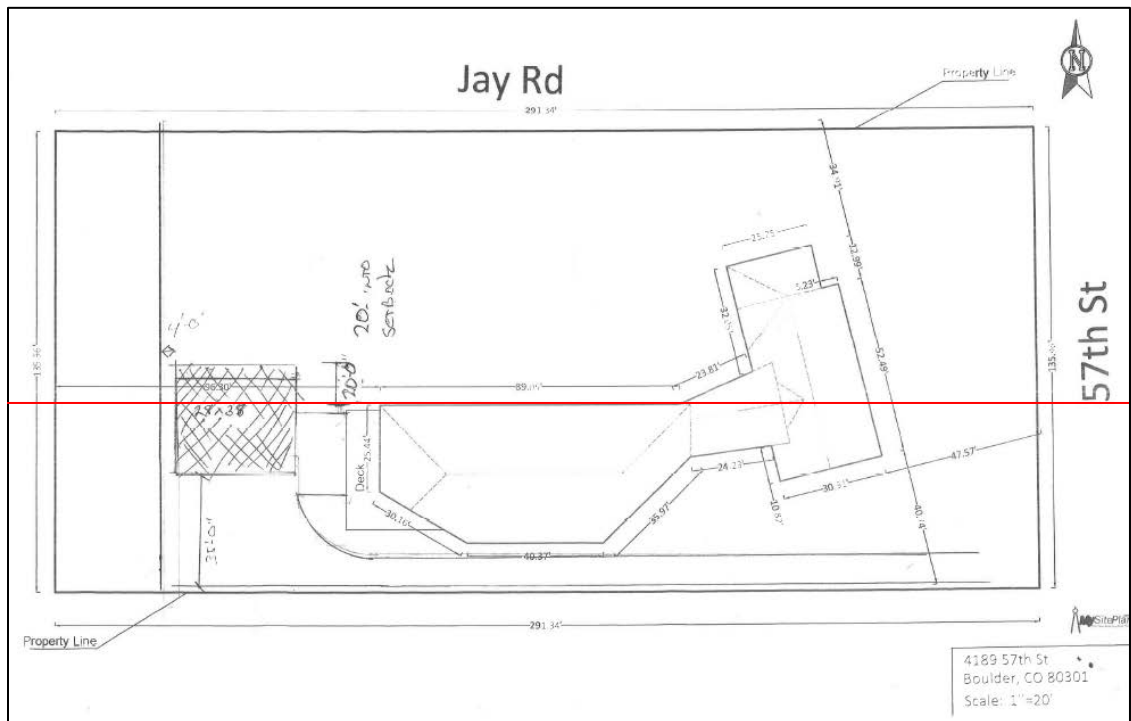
Site Plan showing existing and proposed improvements, supplemental setback boundary indicated by red line. The proposed detached garage is indicated by cross-hatching on the plan.
